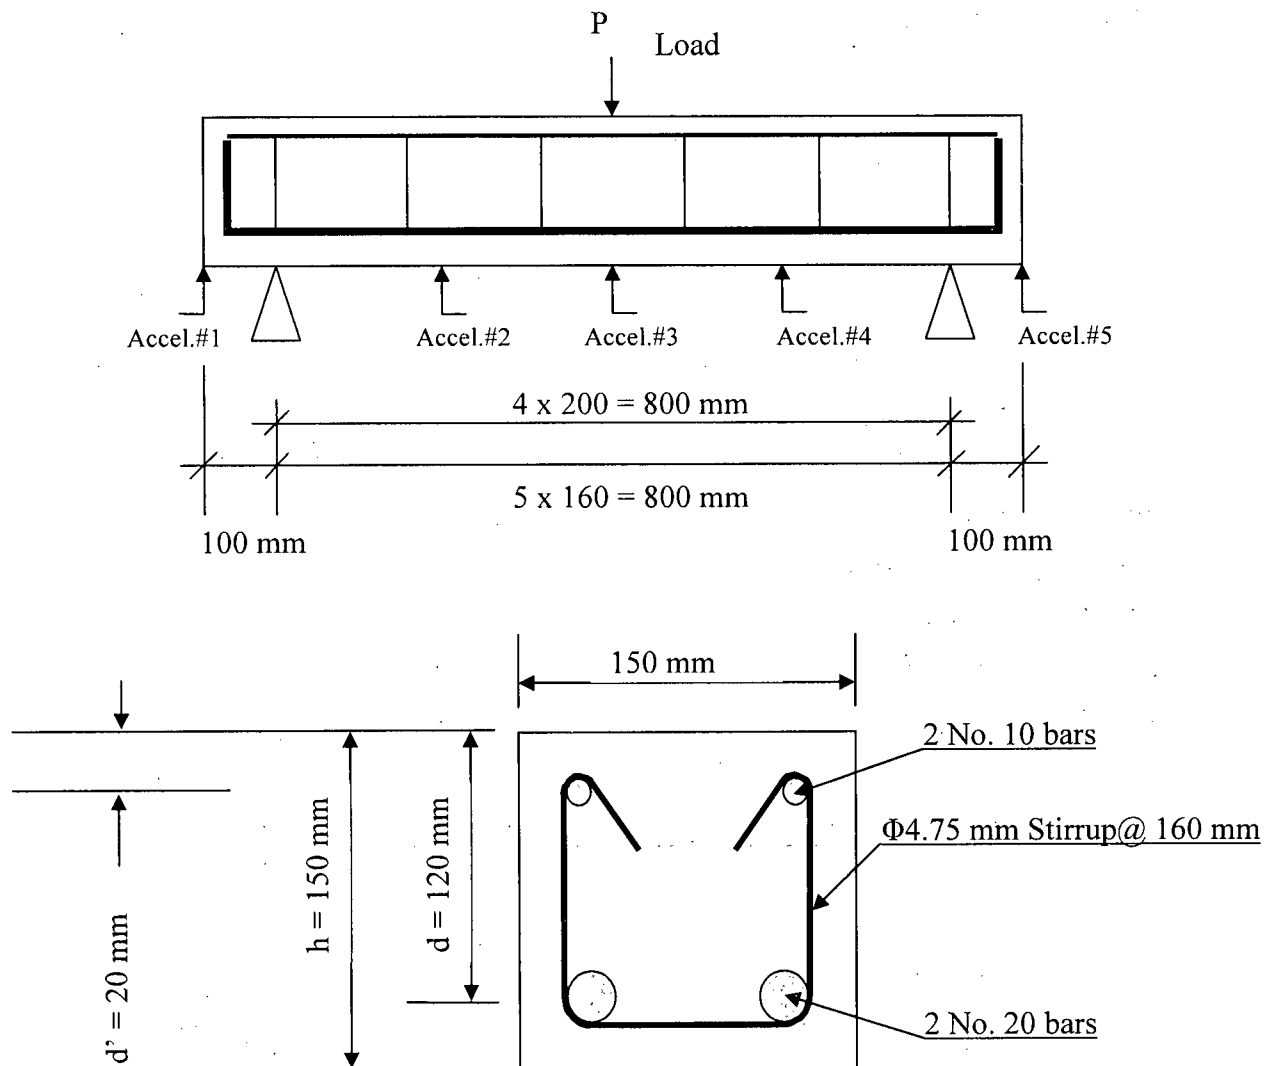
RC Beam Cross-Sectional Details and Location of the Accelerometers in Impact Loading
